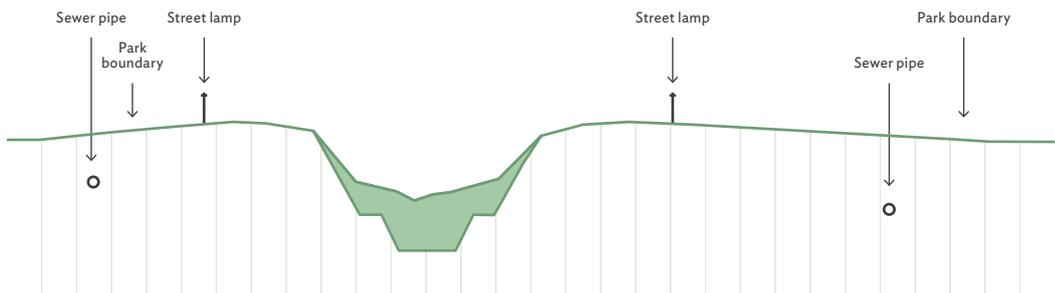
Cross-section profile showing earthworks excavation for the grey infrastructure solution. Green shading indicates the extent of excavation.
